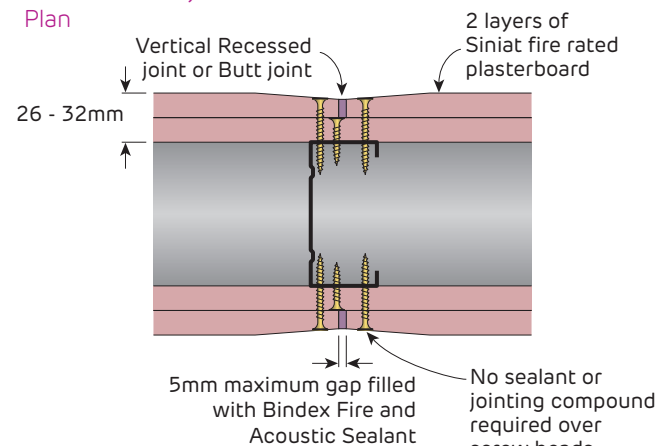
Vertical Joints in Double Layer Wall Systems
